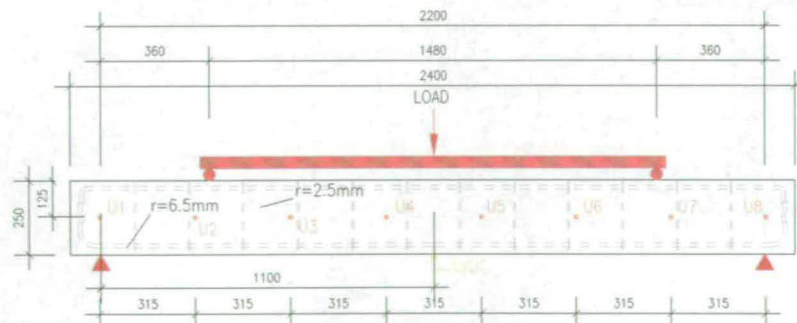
Design details, test configuration and broadband sensor location (UT-1000 type: U1 to U8) of beam K4.
